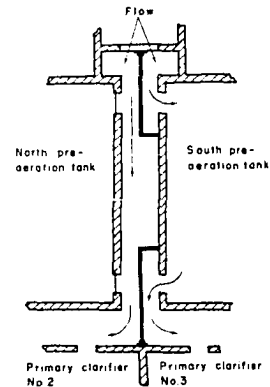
Arrangement of splitters and shear gates during full-scale plant runs
